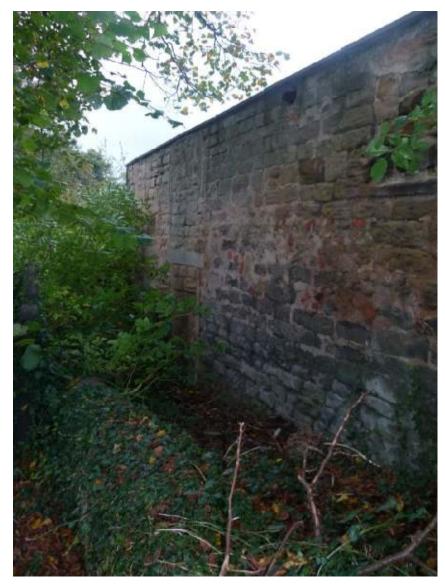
Blocked openings in wall of former Mexborough Old Hall outbuilding
